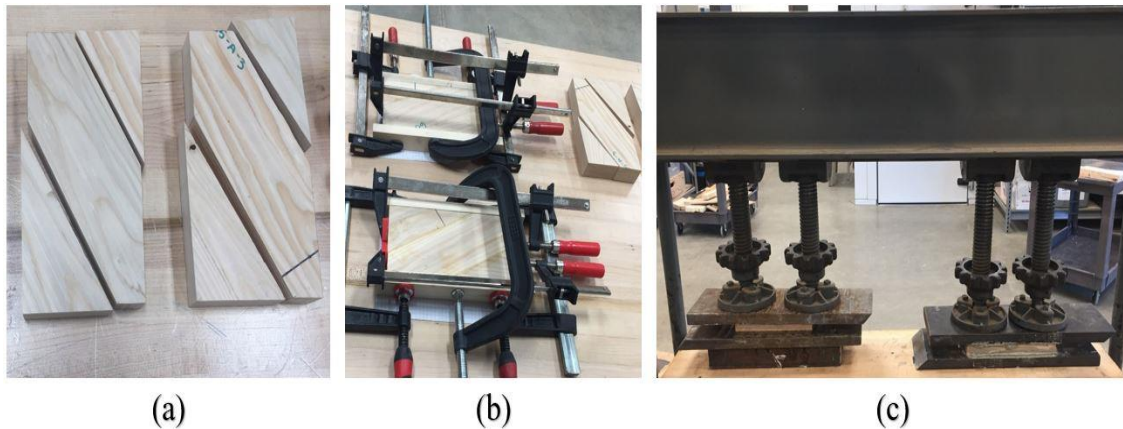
Fabrication process for two-plate shear test assembly: (a) Wood cutting, (b) edge gluing and surface preparation, (c) specimen pressing, curing
